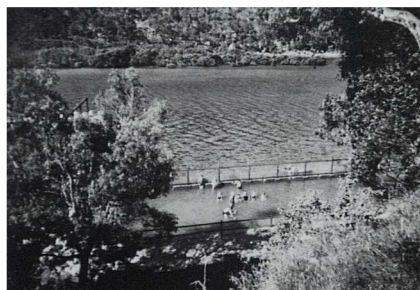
Second Roseville Baths, post 1933, looking north across MH. Timber deck surround not evident. (Ku-ring-gai Library Photo 1038: Michael Kartzoff Collection).
